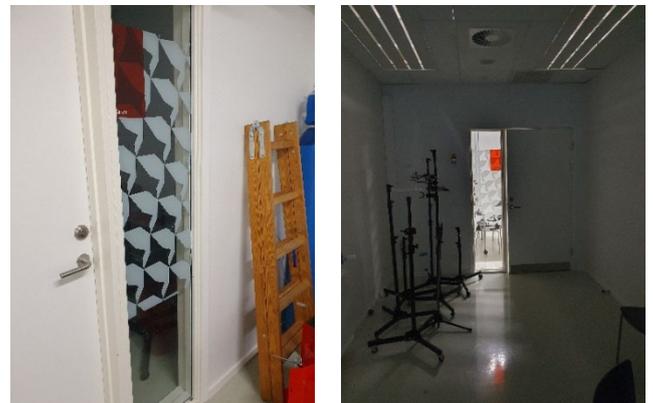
Outside view and inside view of test room door and glazed element before louvre installation.
